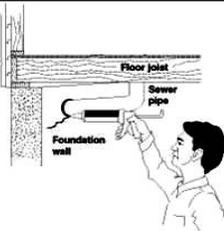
Caulk any gaps around the openings in the basement wall through which services (electrical, plumbing, heating) enter the house.
